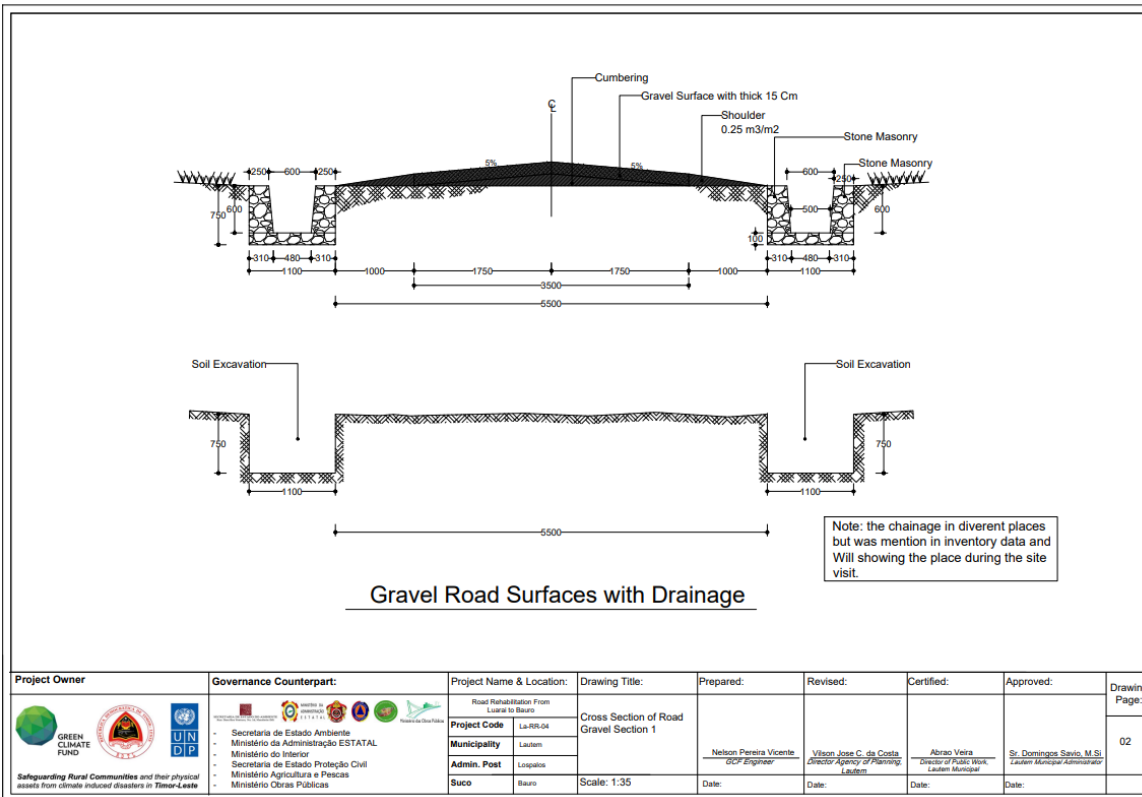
Earth Works (leveling, cambering, gravel and drainage)
